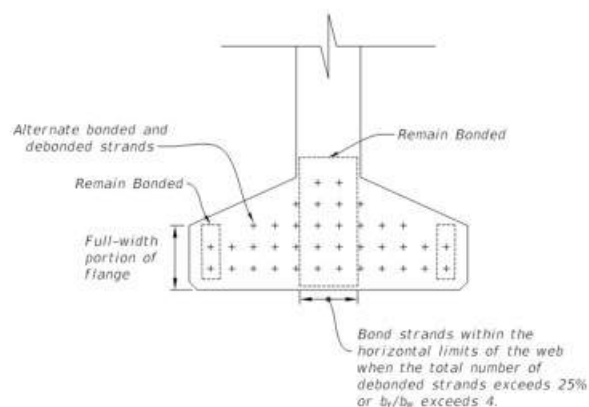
Details for Single-Web Flanged Sections
